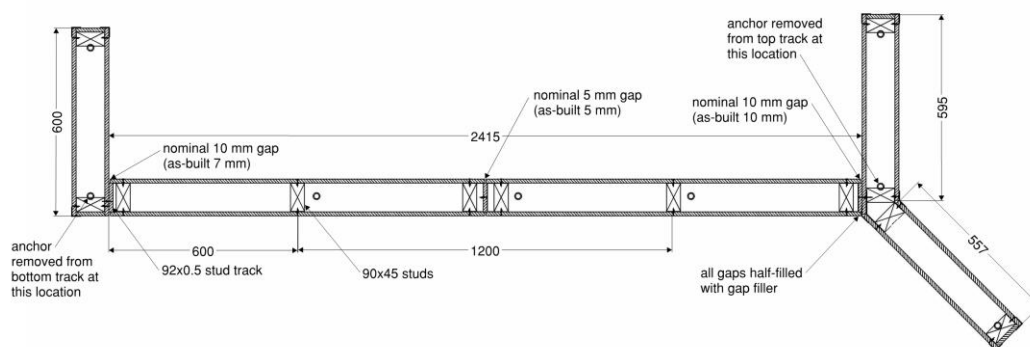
Specimen 2 plan – timber stud wall in steel tracks with intermediate joints.
